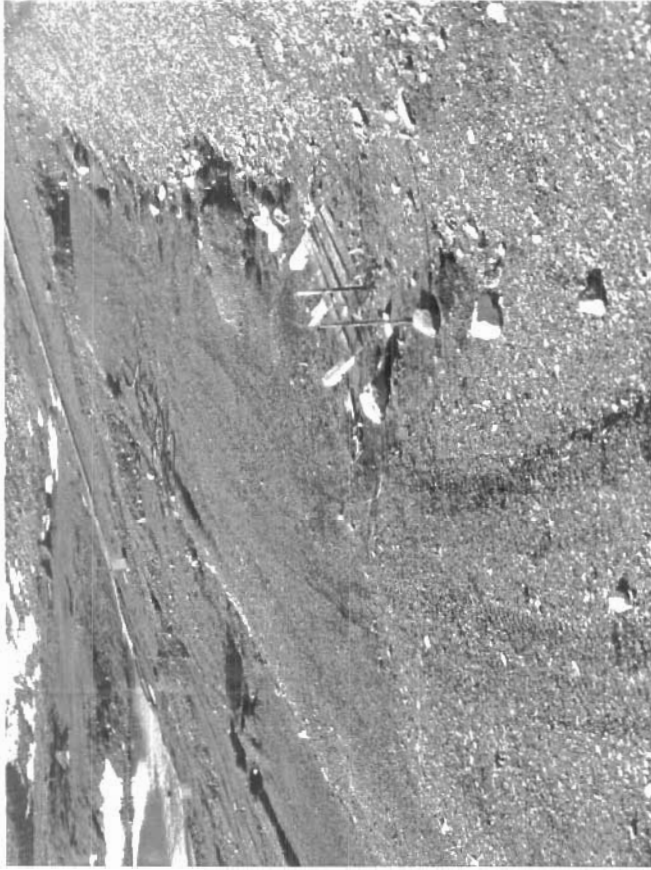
shows a view of the crest of two benches located just below the crest. On the level just below the crest, there is a subtle oblique crack running across the crest. On the second lower bench, there appears to be several transverse cracks.
